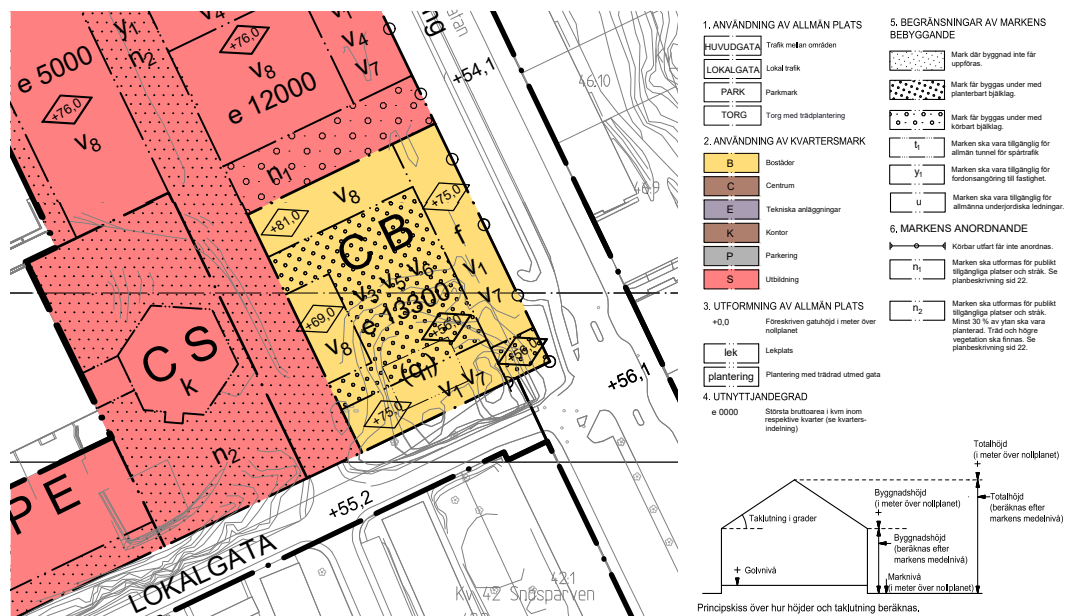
Developed detail plan Gibraltarvallen 1:2000. (Göteborgs Stad, 2018).
